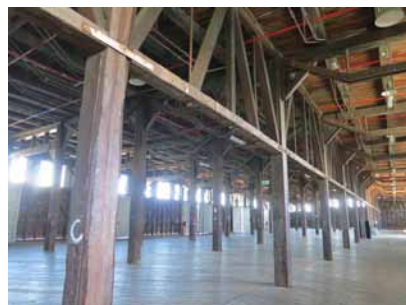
Pier 2.3 Ground floor. North end/former loggia extended, looking north.
